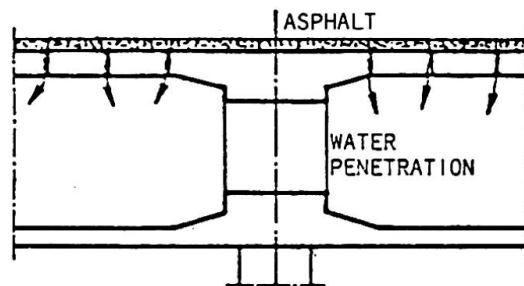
BRIDGE DECK WITHOUT WATERPROOFING
